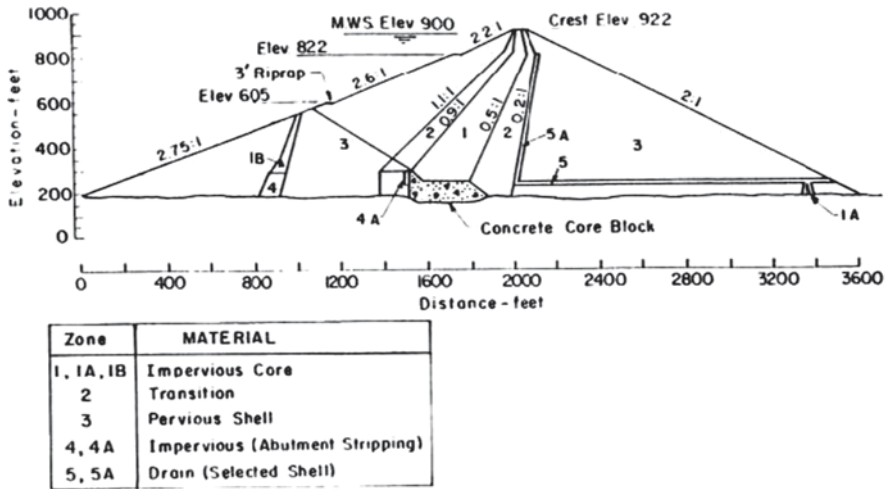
Oroville dam cross section. (after Banerjee et al. 1979).
